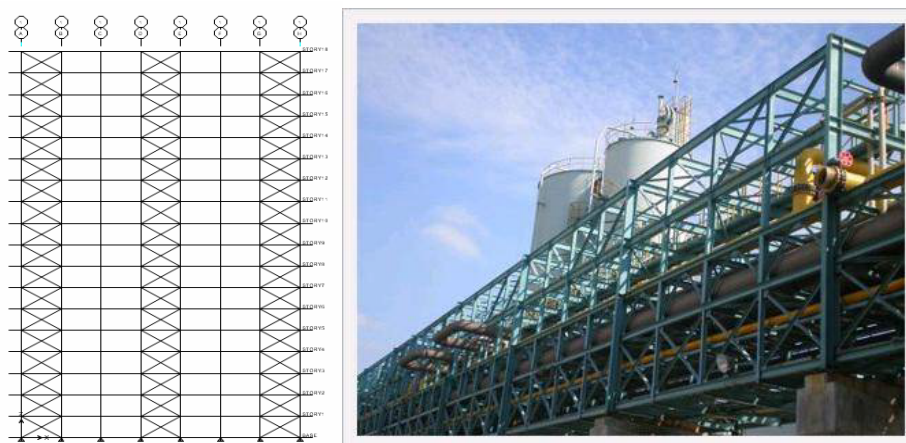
7S (1,4,7) Steel Framed Building and a 4 Story Pipe Rack Structure
